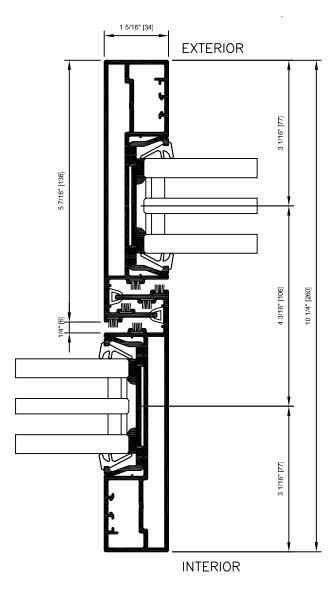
Pocket Interlock with Sliding Panel and 1 Track
